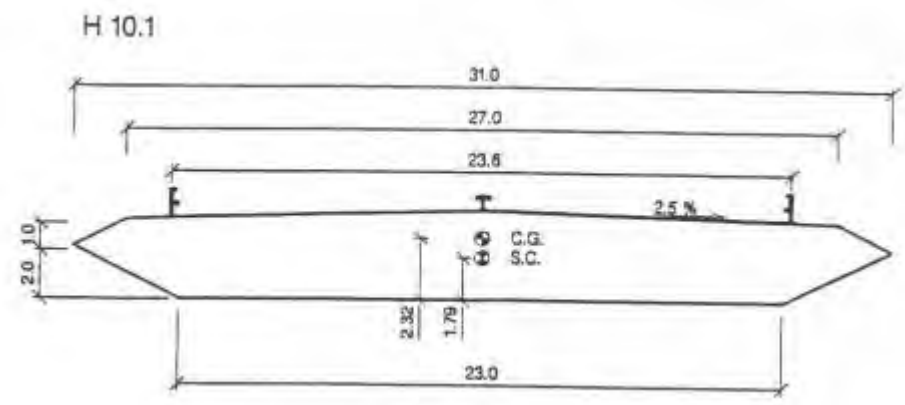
Alternative H10.1 deck section, suspension bridge, Storebælt East Bridge.
